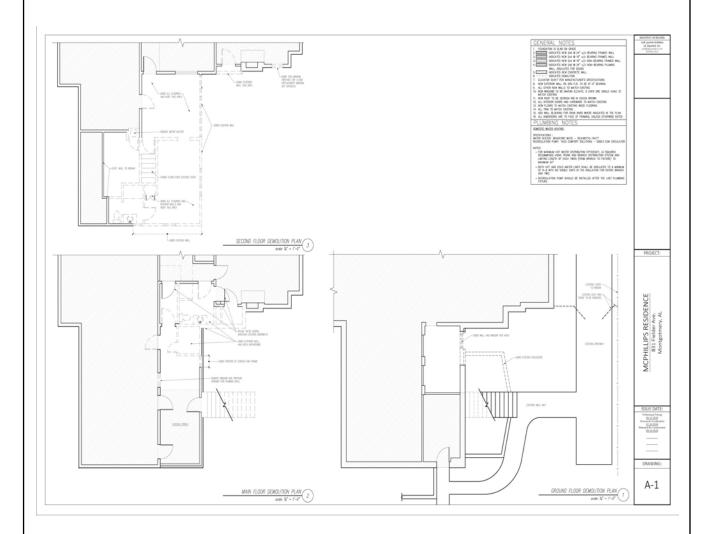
Demolition floor plans (all levels) for 831 Felder Ave.
